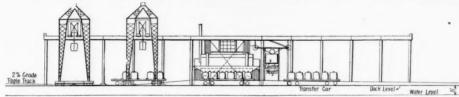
Front Elevation of Brown Coal Handling Plant, Looking from Water.
